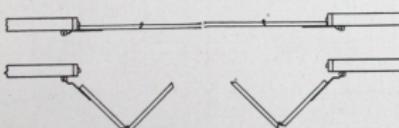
A—Floor plans of four-door "Slidelite" No. 1035 doorway showing, (1) doors closed, (2) doors partially opened.
